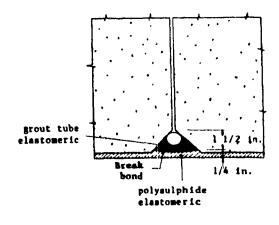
REPAIR OF VERTICAL JOINTS IN RICHARD B. RUSSELL DAM -SAVANNAH, GEORGIA<sup>22</sup>
